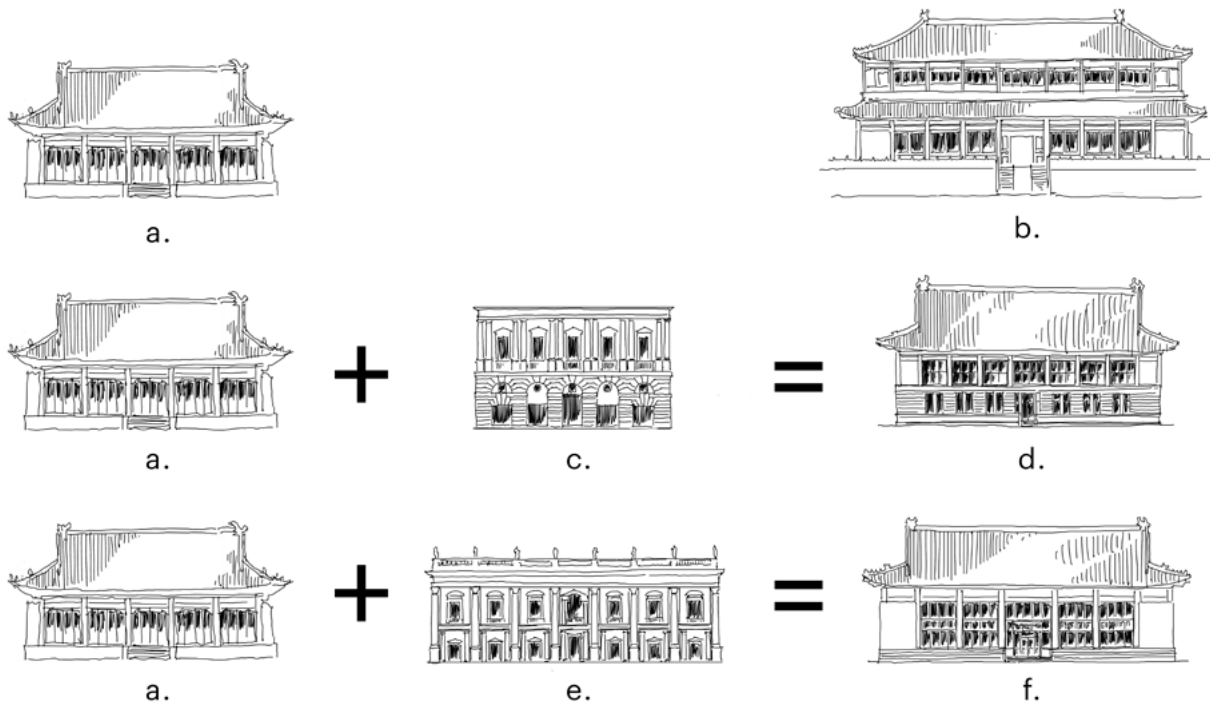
Diagrams synthesizing two-story elevations: (a) typical traditional Chinese palace, after Prince Gong’s Mansion, Beijing; (b) traditional way of forming two-story buildings with an eave as a horizontal division; (c) Renaissance palazzo, after Bramante’s Palazzo Caprini; (d) Murphy’s Ginling College building; (e) colossal order, after Michelangelo’s Campidoglio; (f) Murphy’s Yenching building
